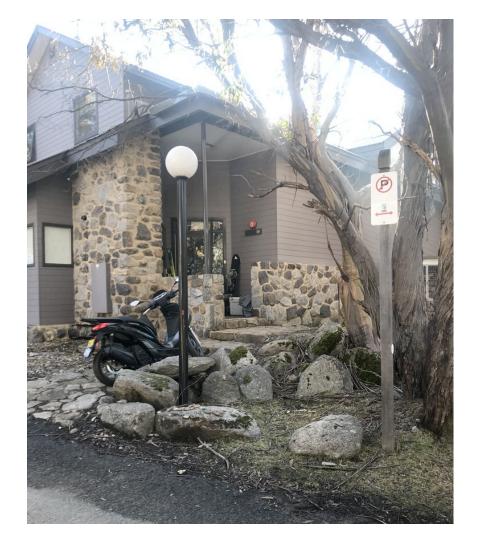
Showing area of the proposed Alterations & Additions for Garage & Studio over Garage
